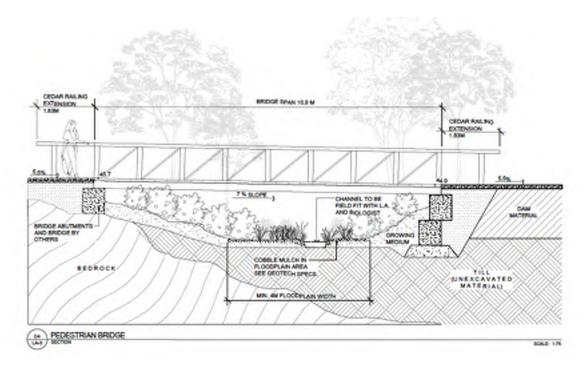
Cross section of the bridge in Figure 22 (Paul de Greeff Landscape Architect, 2021), showing a simple abutment design, with a stream/wetland beneath the structure. This type of structure would provide a viewing platform looking over the wetland.
